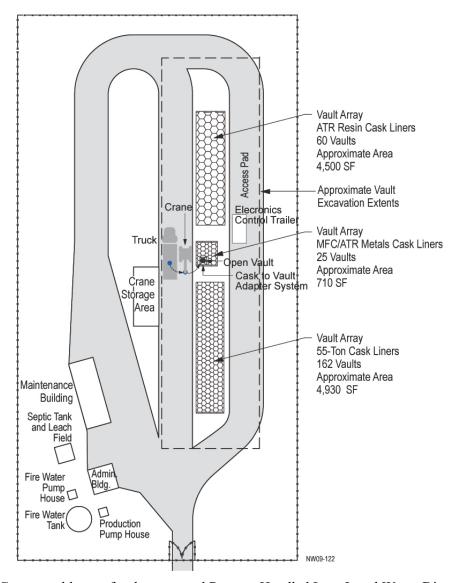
Conceptual layout for the proposed Remote-Handled Low-Level Waste Disposal Facility.
